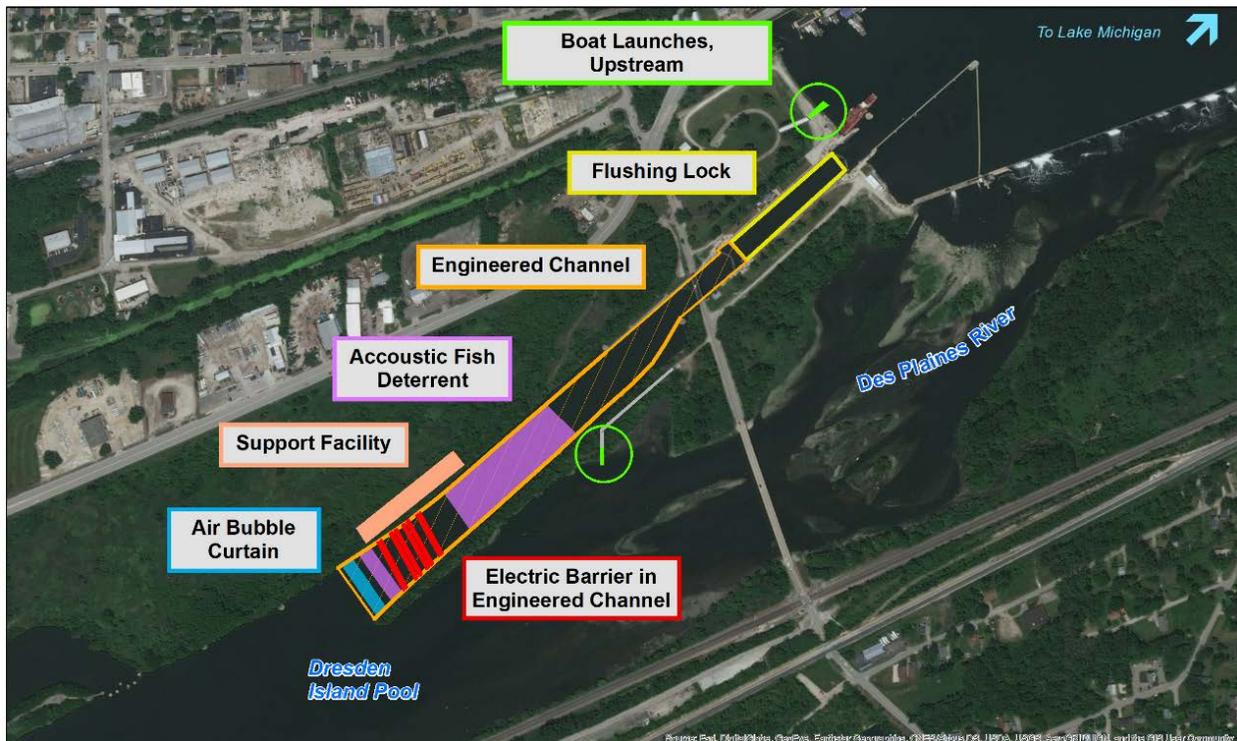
Aerial View of Brandon Road Lock and Dam with Potential Layout of Technology Alternative–Acoustic Fish Deterrent with Electric Barrier
